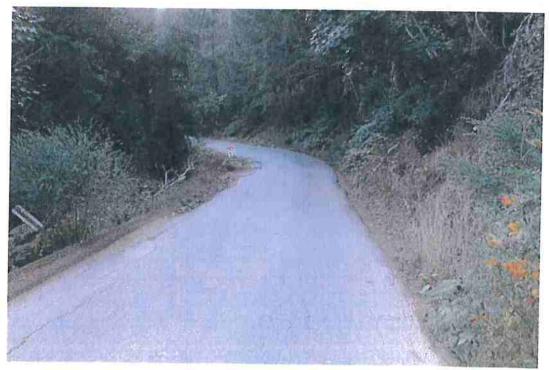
Mile 2.35: ~15-ft road width pinch point at partial road failure.
